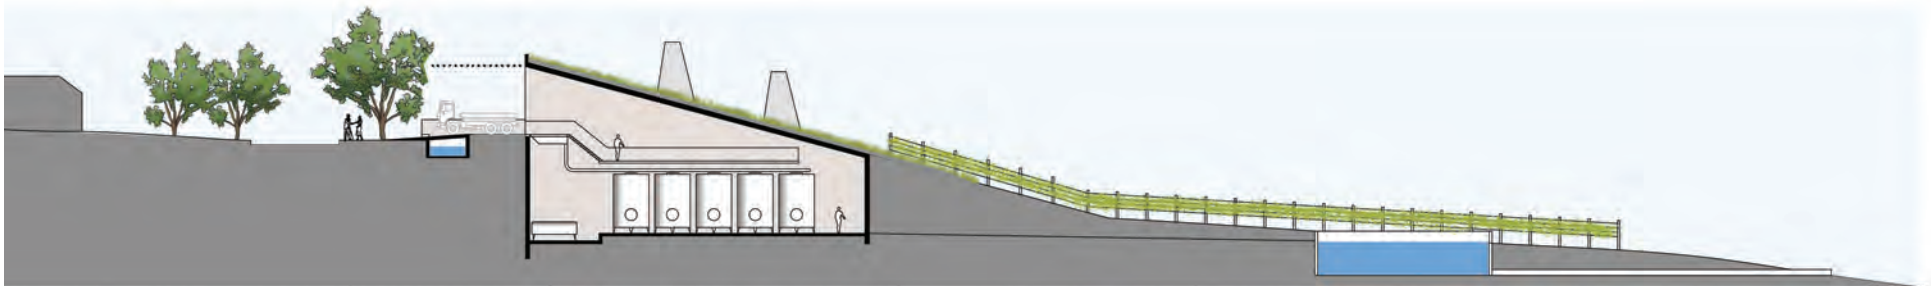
(ABOVE): Section through sketch design for the winery. (Author)
